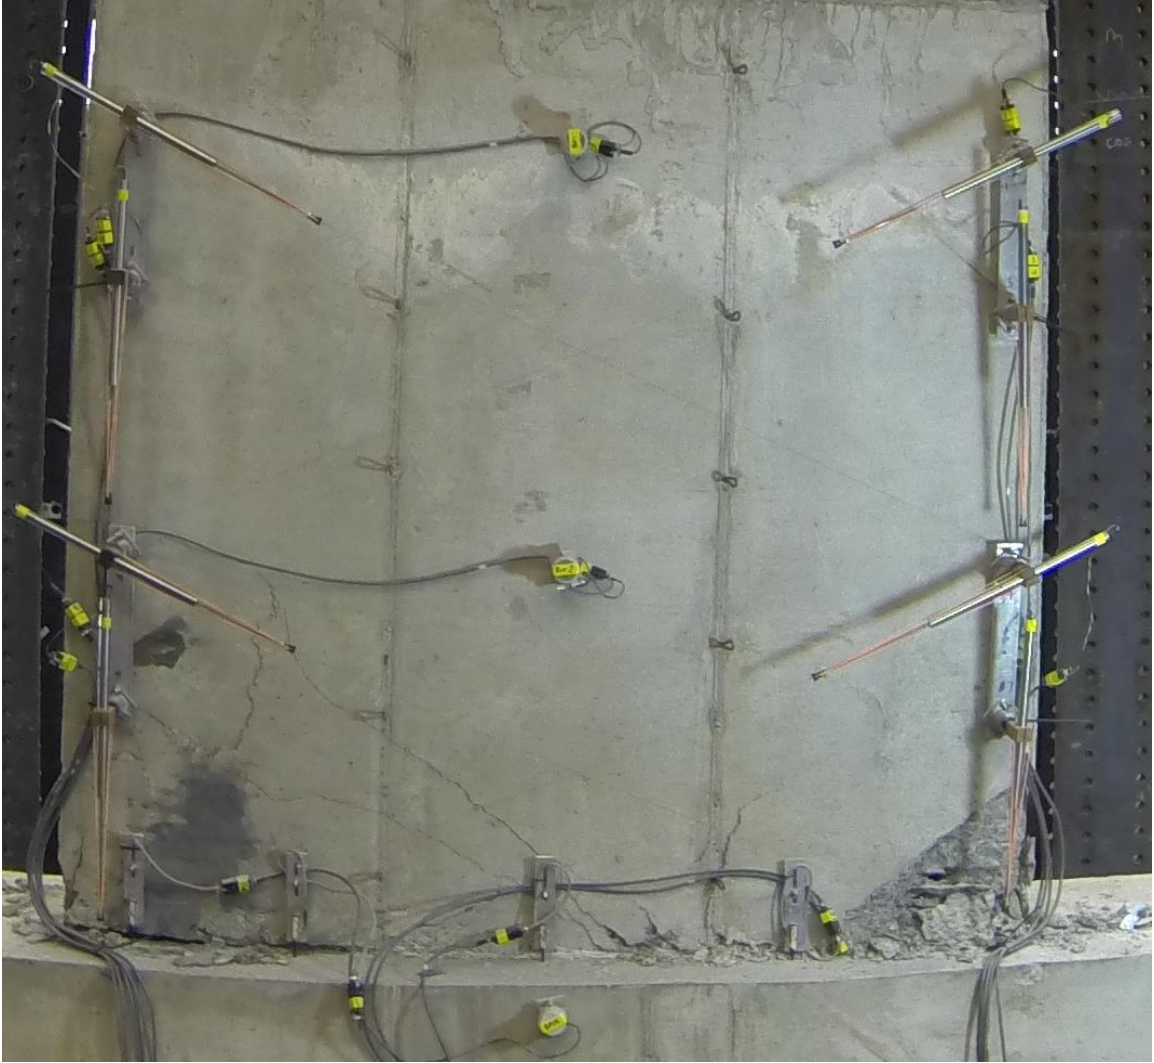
Wall condition at the end of Cycle 35W on the North side Wall 3
